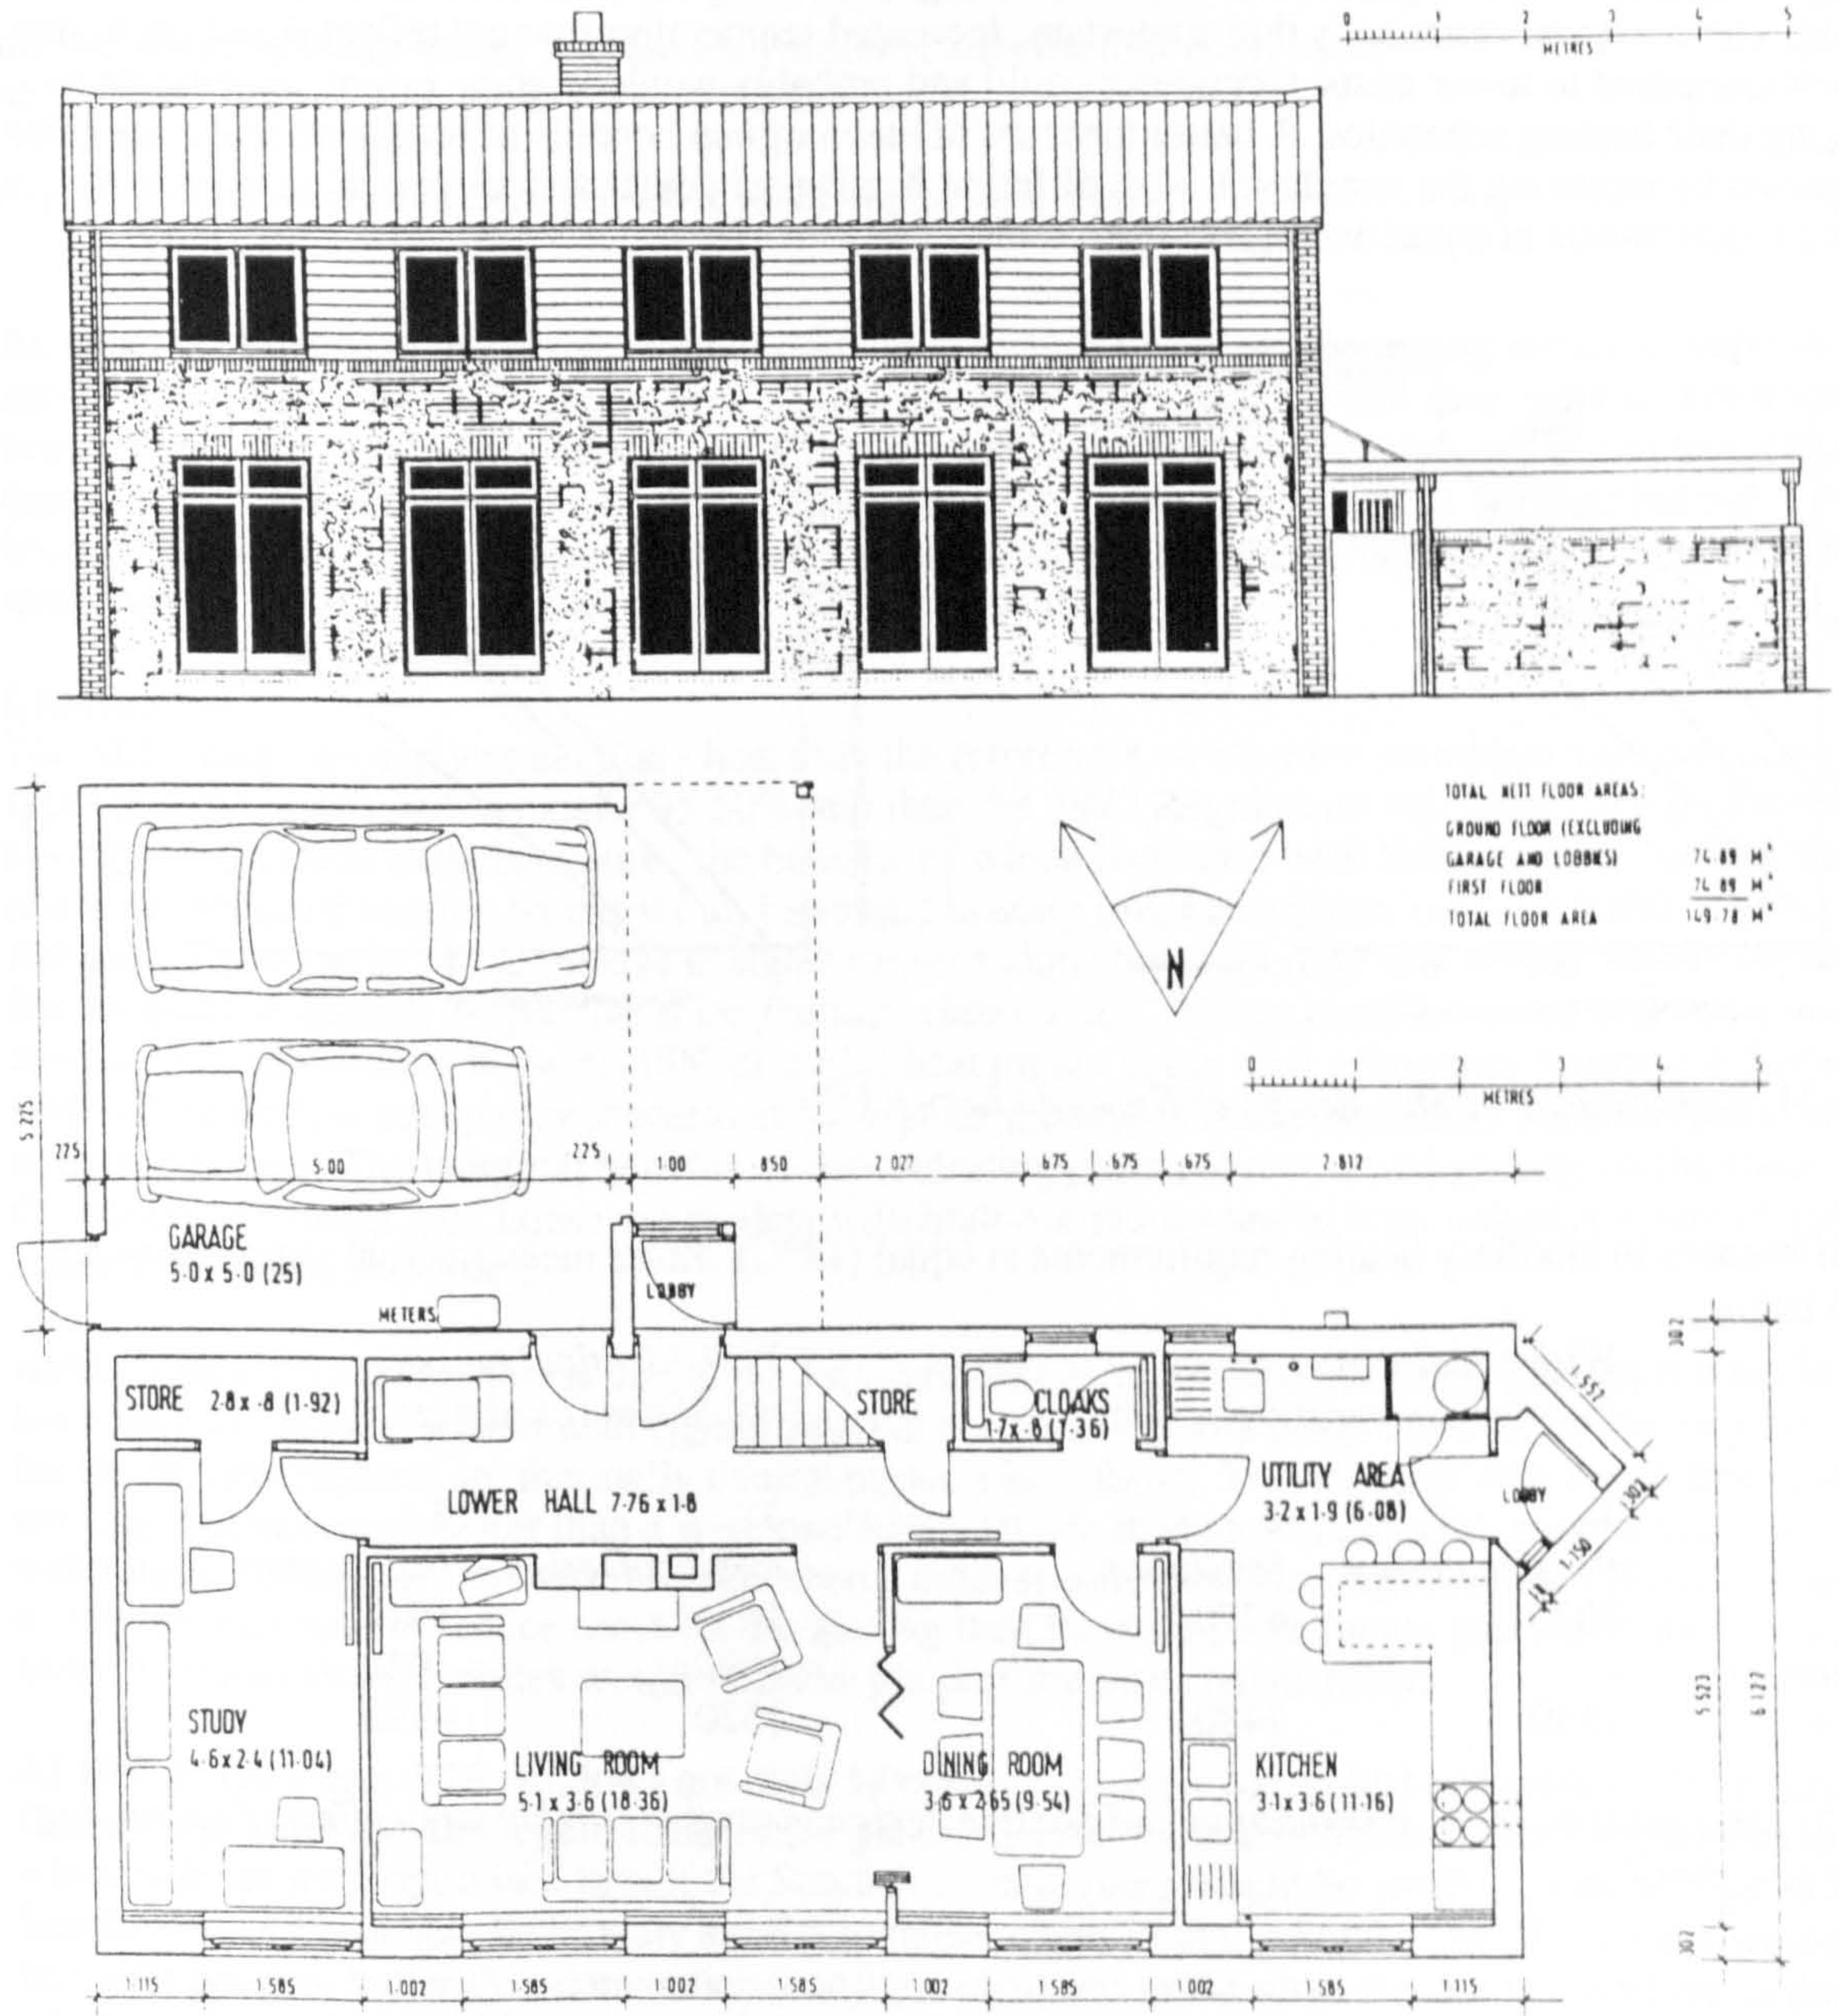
Front elevation and plan of SEF design<sup>75</sup>
